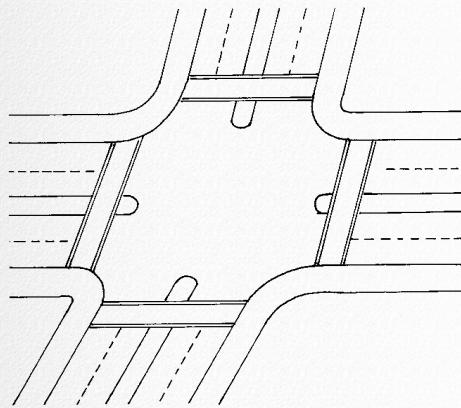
GOOD DESIGN: When skewed intersections are unavoidable, crosswalks should be placed at the expected location, and accessible medians should be installed to break up the long crossing distances.
